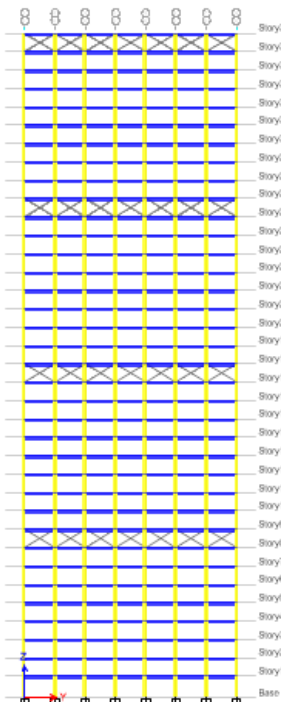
Perspective view of a storey showing outrigger and Belt truss (Model 3)
